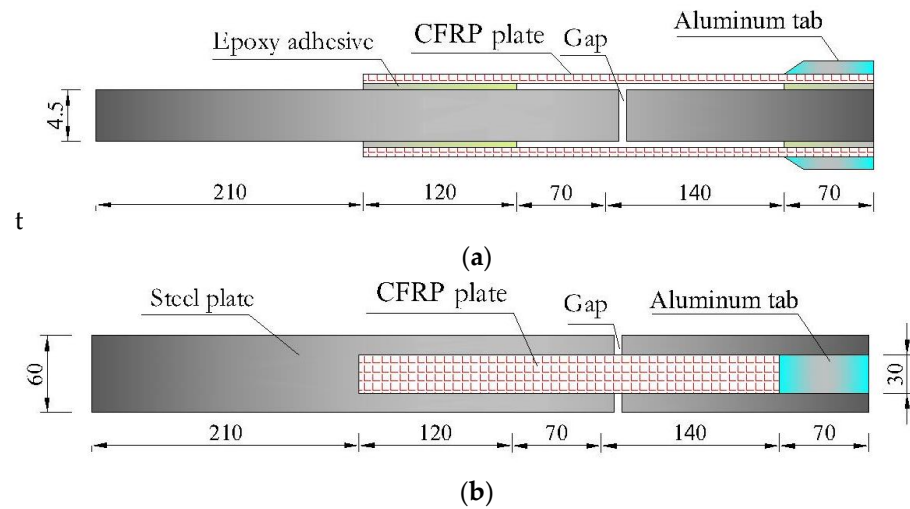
Schematic view of CFRP/steel double strap joint: (a) front view; (b) side view (unit: mm).
